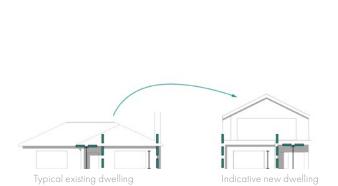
Demonstration of how the facade on a new dwelling can be articulated to respect the proportions of an existing adjacent dwelling.
